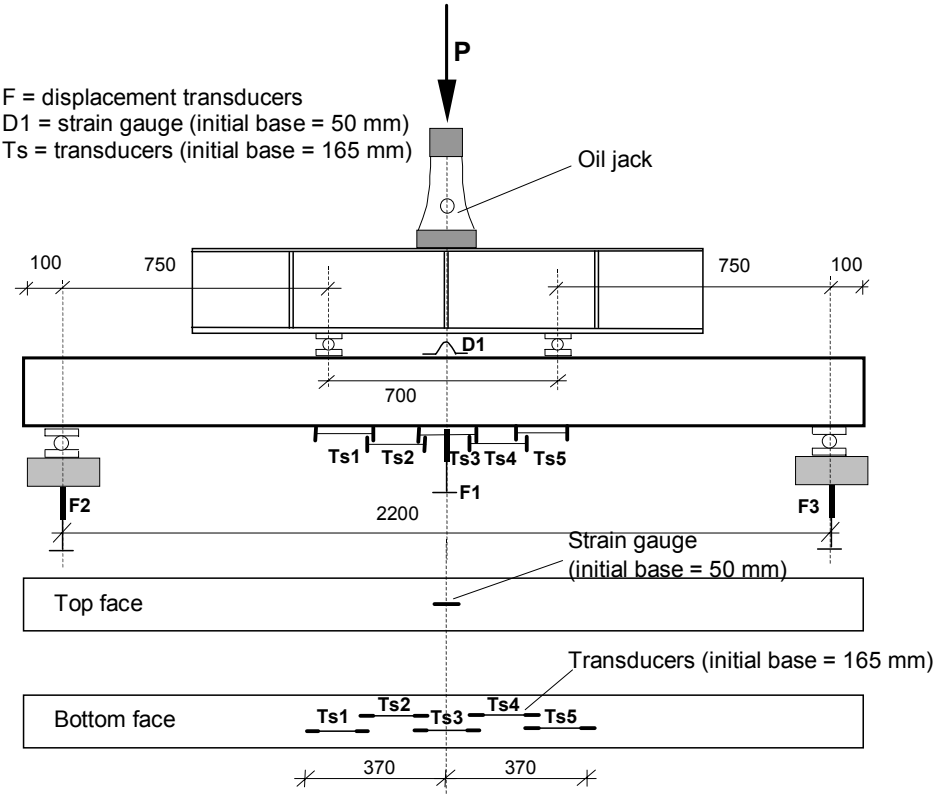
Test setup of the beams and details of the instrumentation (dimensions in mm).
